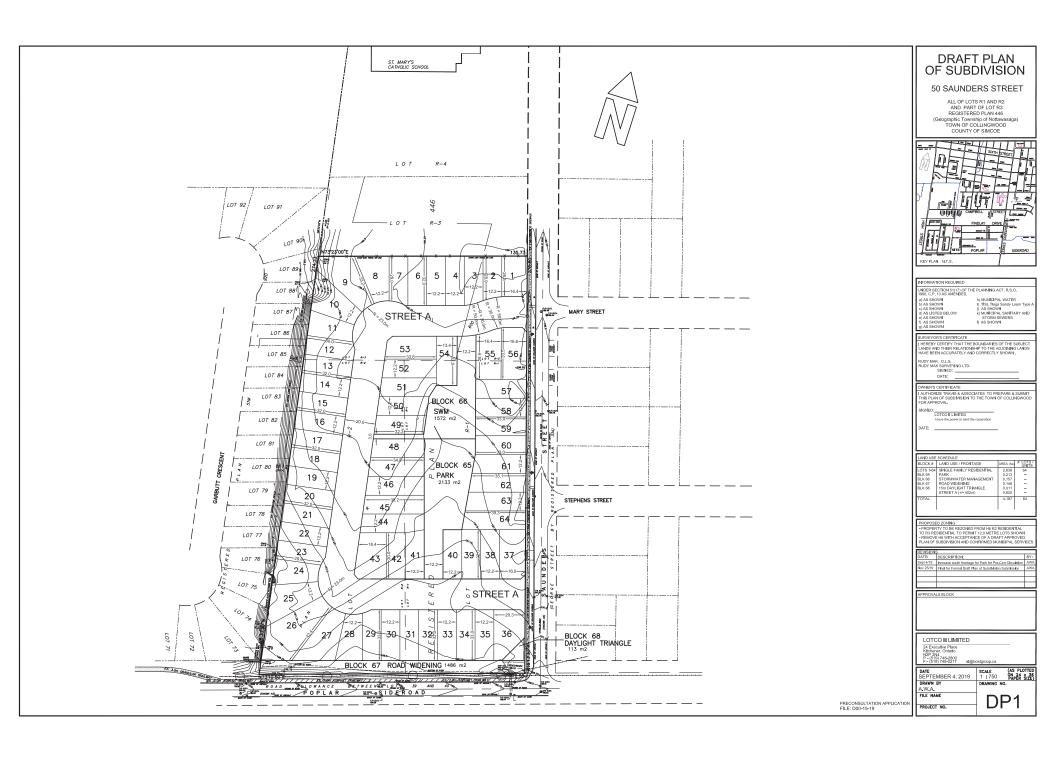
Draft Plan Showing Barrier and Ventilation Requirements
